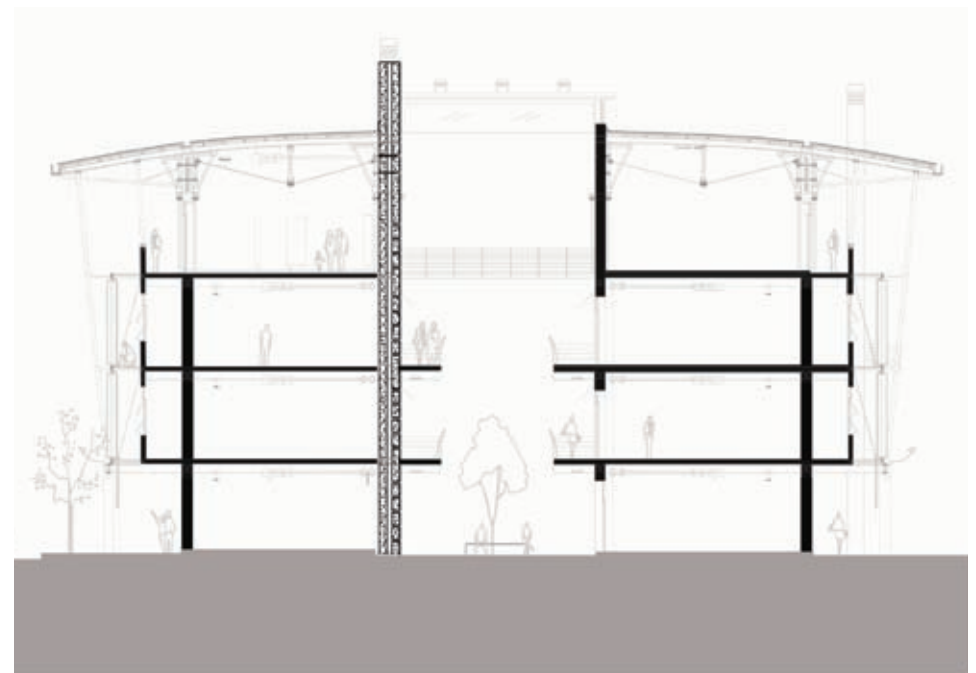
Northern section through building illustrating structural elements
